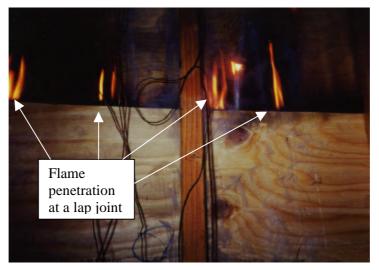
Flame penetration occurred through a T&G joint in a soffit constructed with nominal 1-inch (25 mm) boards. This view is from the interior of the attic/soffit area.
